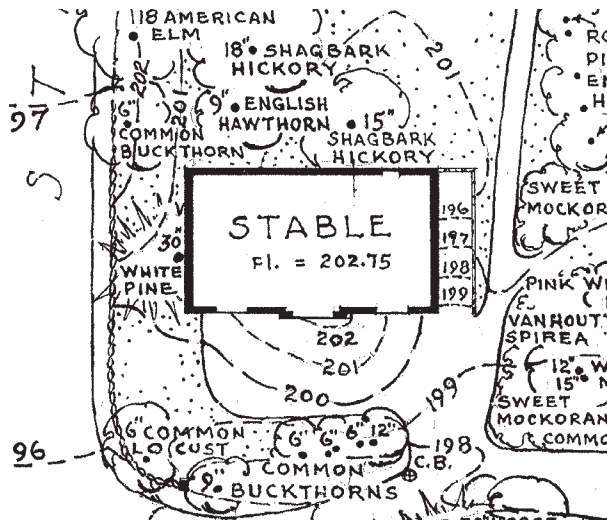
HABS plan of the carriage house, showing the slope of the ramp.
